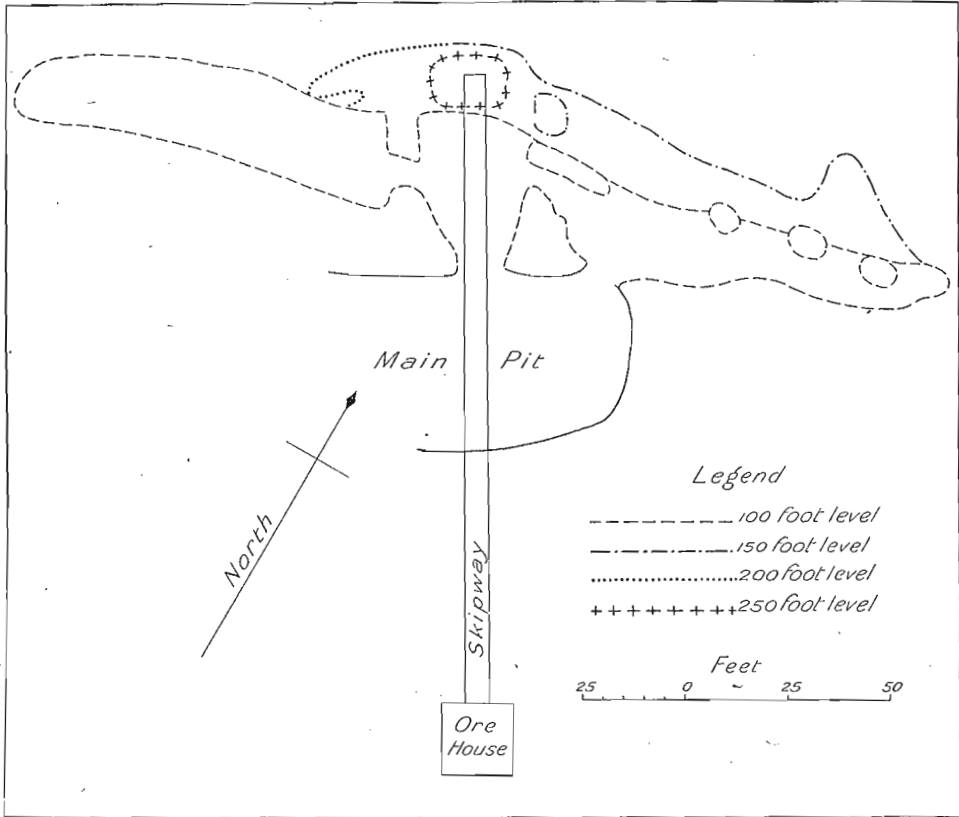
Plan of underground workings, Globe Graphite Mining and Refining Company, lot 21, concession VI, North Elmsley township, Ontario.
